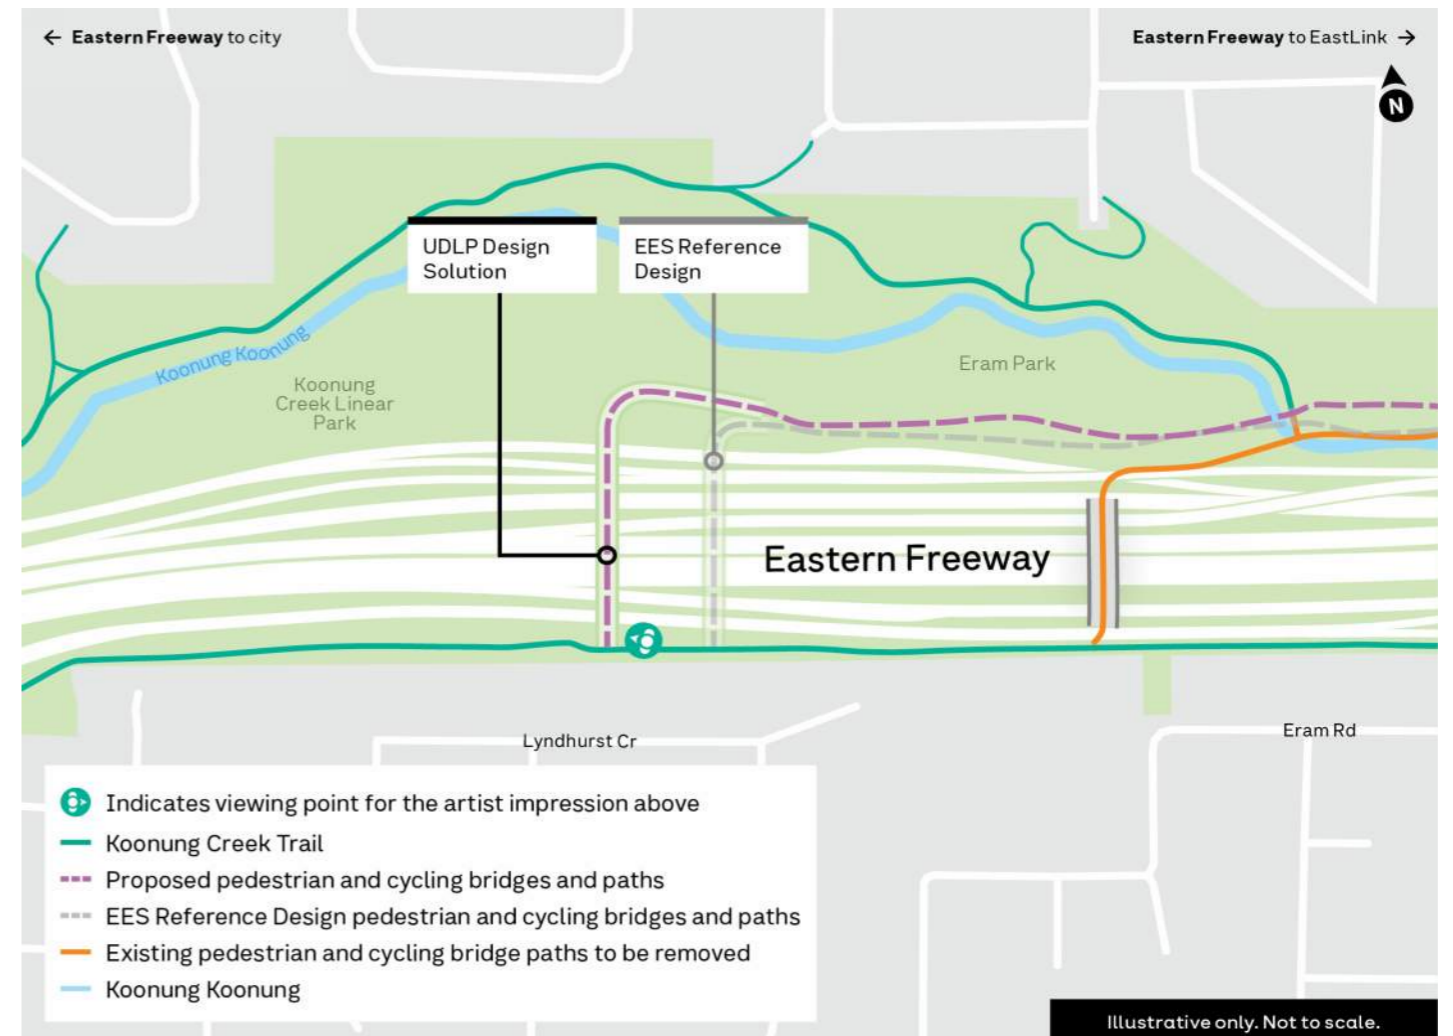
Location of new Eram Road pedestrian and cycling bridge compared to EES Reference Design
